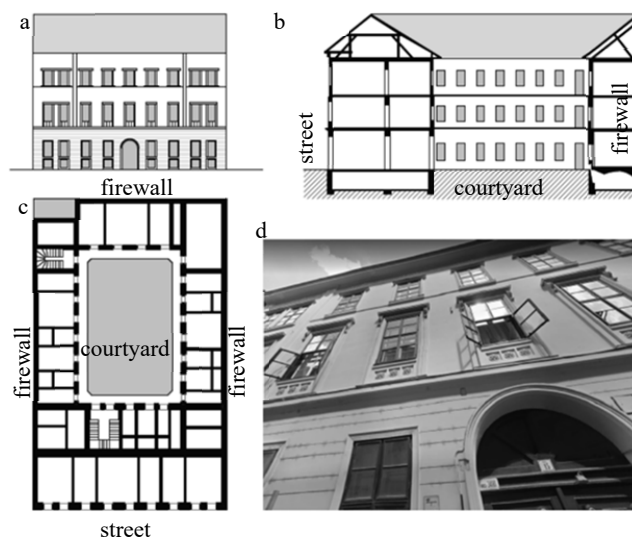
Characteristic multi-apartment residential building in Budapest. (a) Street front façade. (b) Cross section, (c) First floor plan, (d) Façade detail with historical style elements
